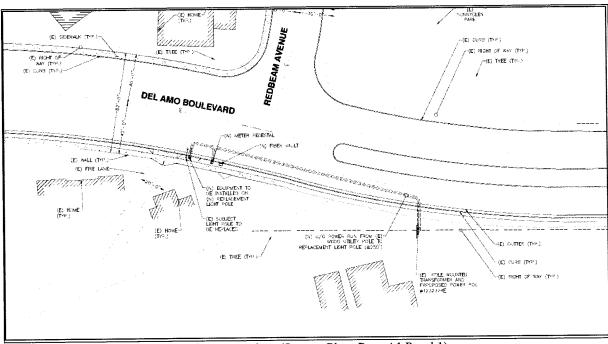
Underground power and fiber connections (Source: Plans Page A1 Panel 1).
